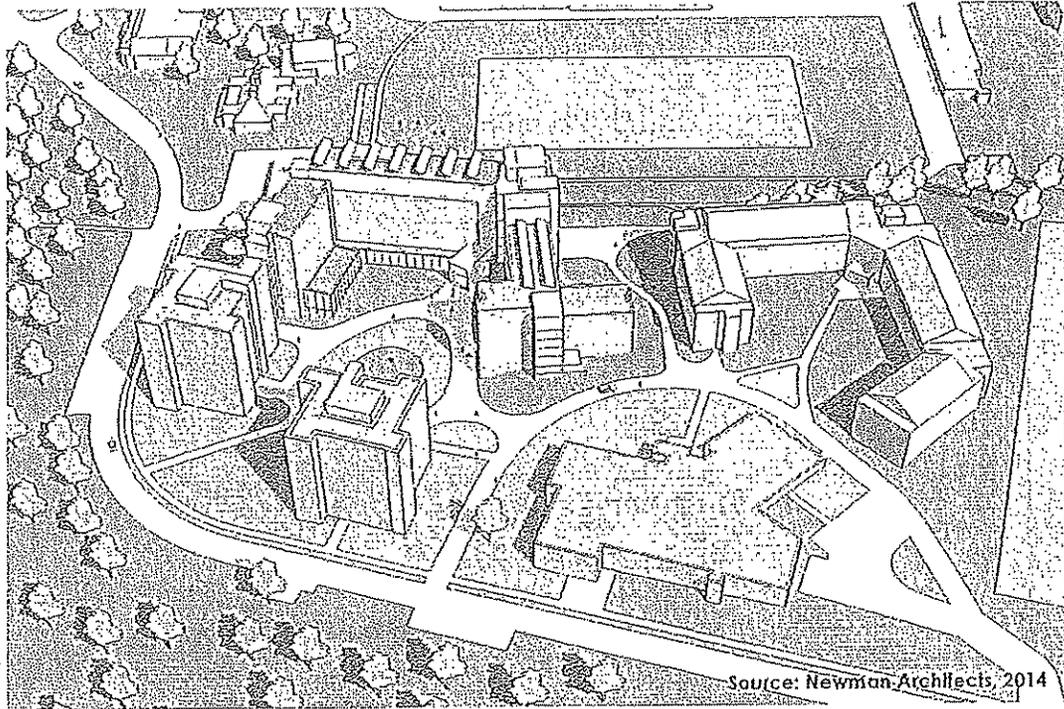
Proposed STEM Residence Hall Architectural Rendering Facing East
